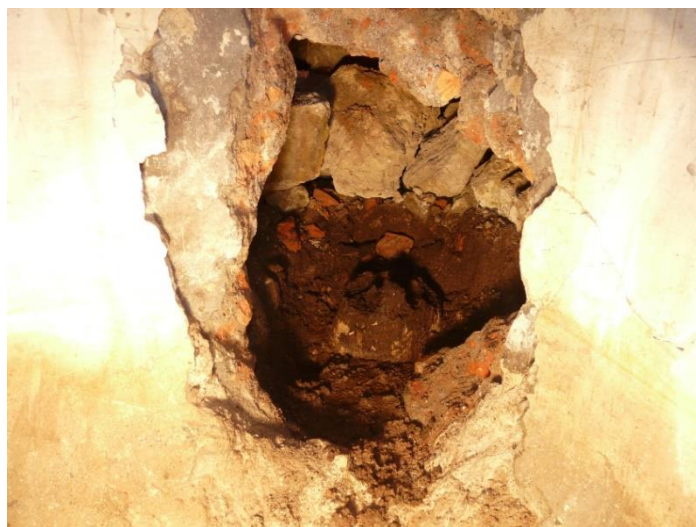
Apraksin Yard, house 4, Saint-Petersburg. Destruction of the tops of wooden piles
